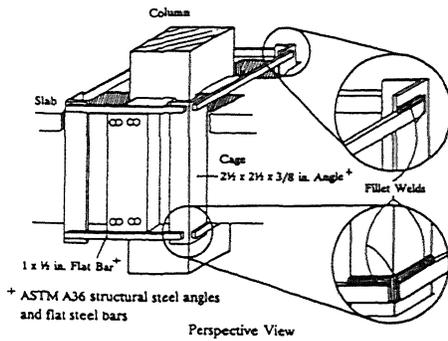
Joint confinement cage (1 in. = 25.4 mm).
